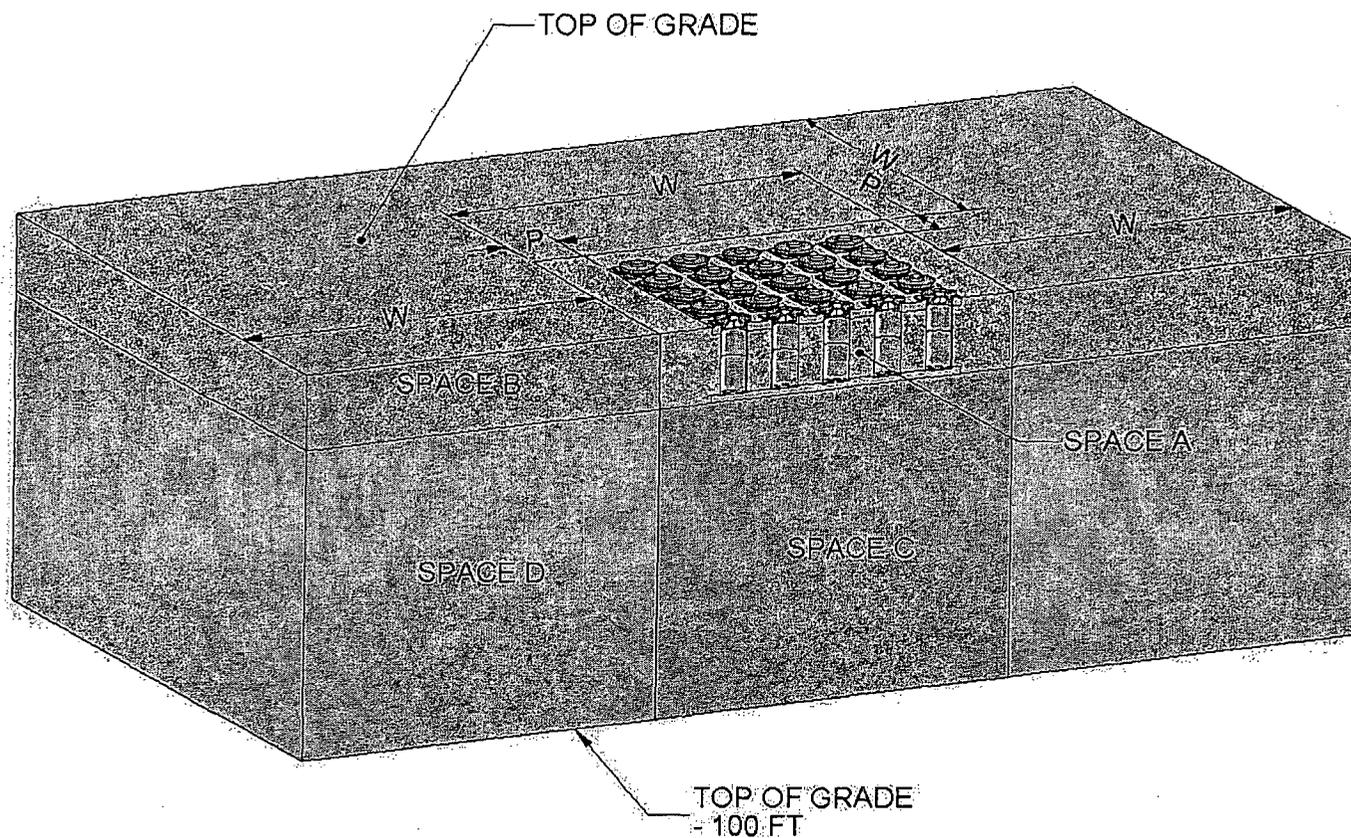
SUB-GRADE AND UNDER-GRADE SPACE NOMENCLATURE
